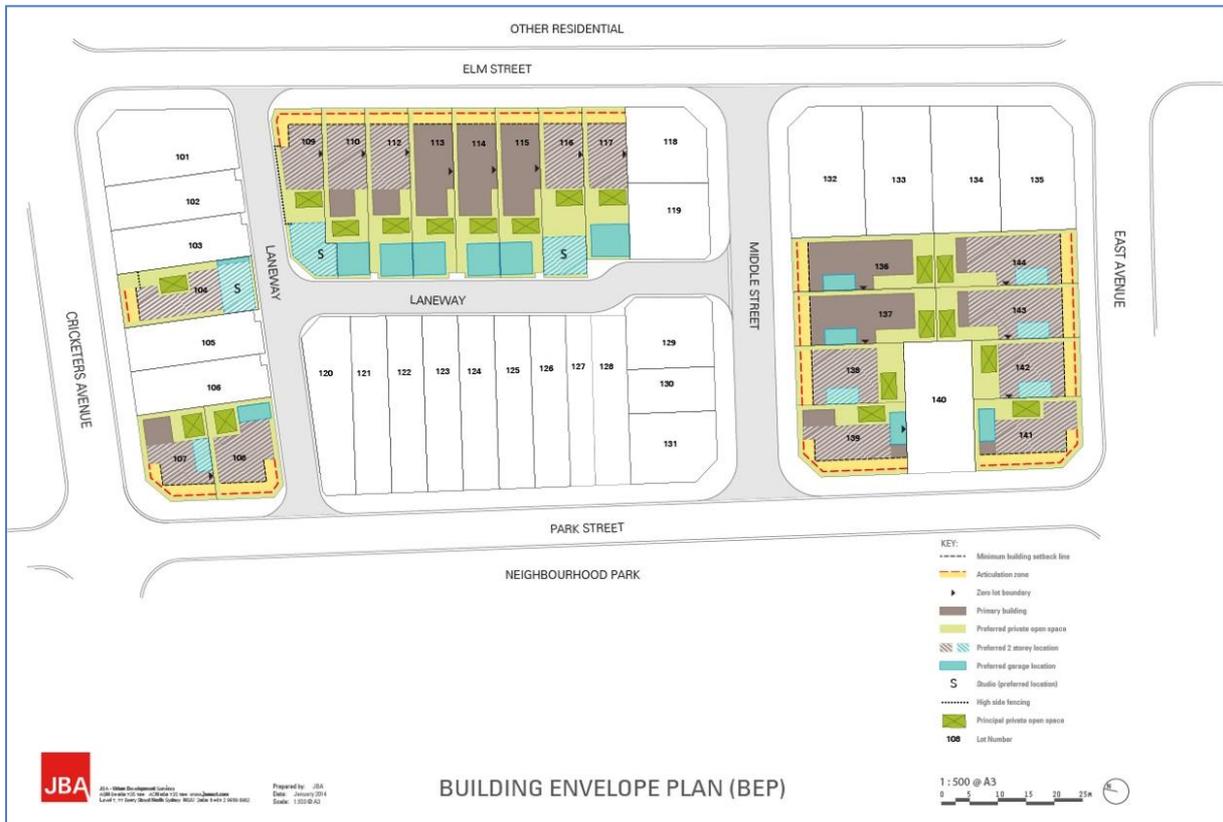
Sample of a Building Envelope Plan (BEP)
